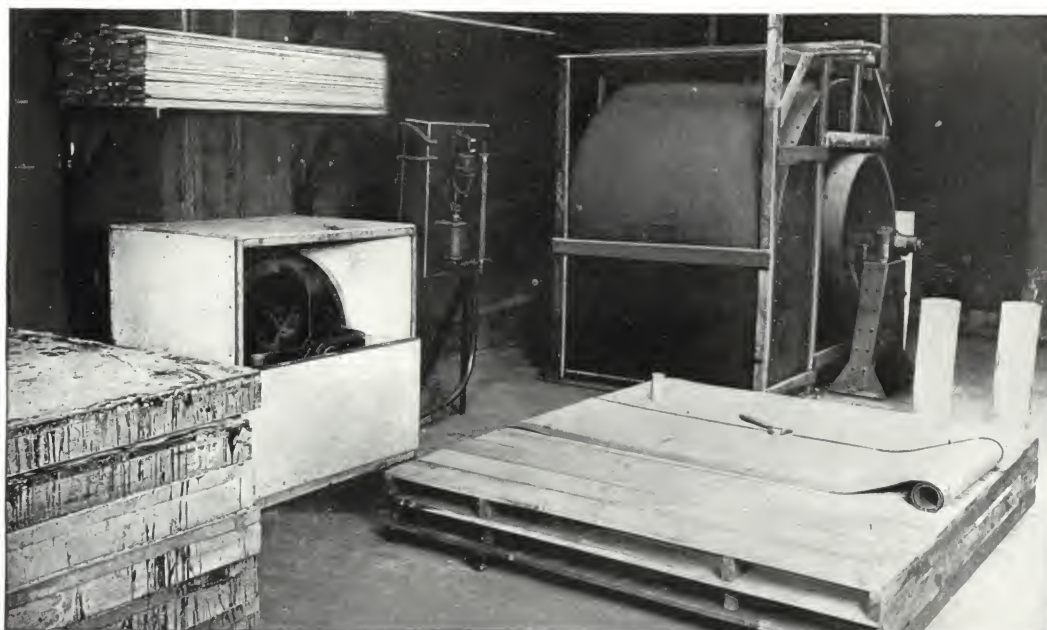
APPLYING SAMPLE ROOFING TO STANDARD DECKS FOR TESTS
